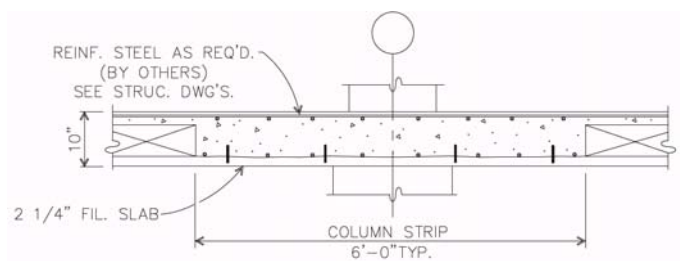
Typical Floor Section Showing Precast Filigree Slab
